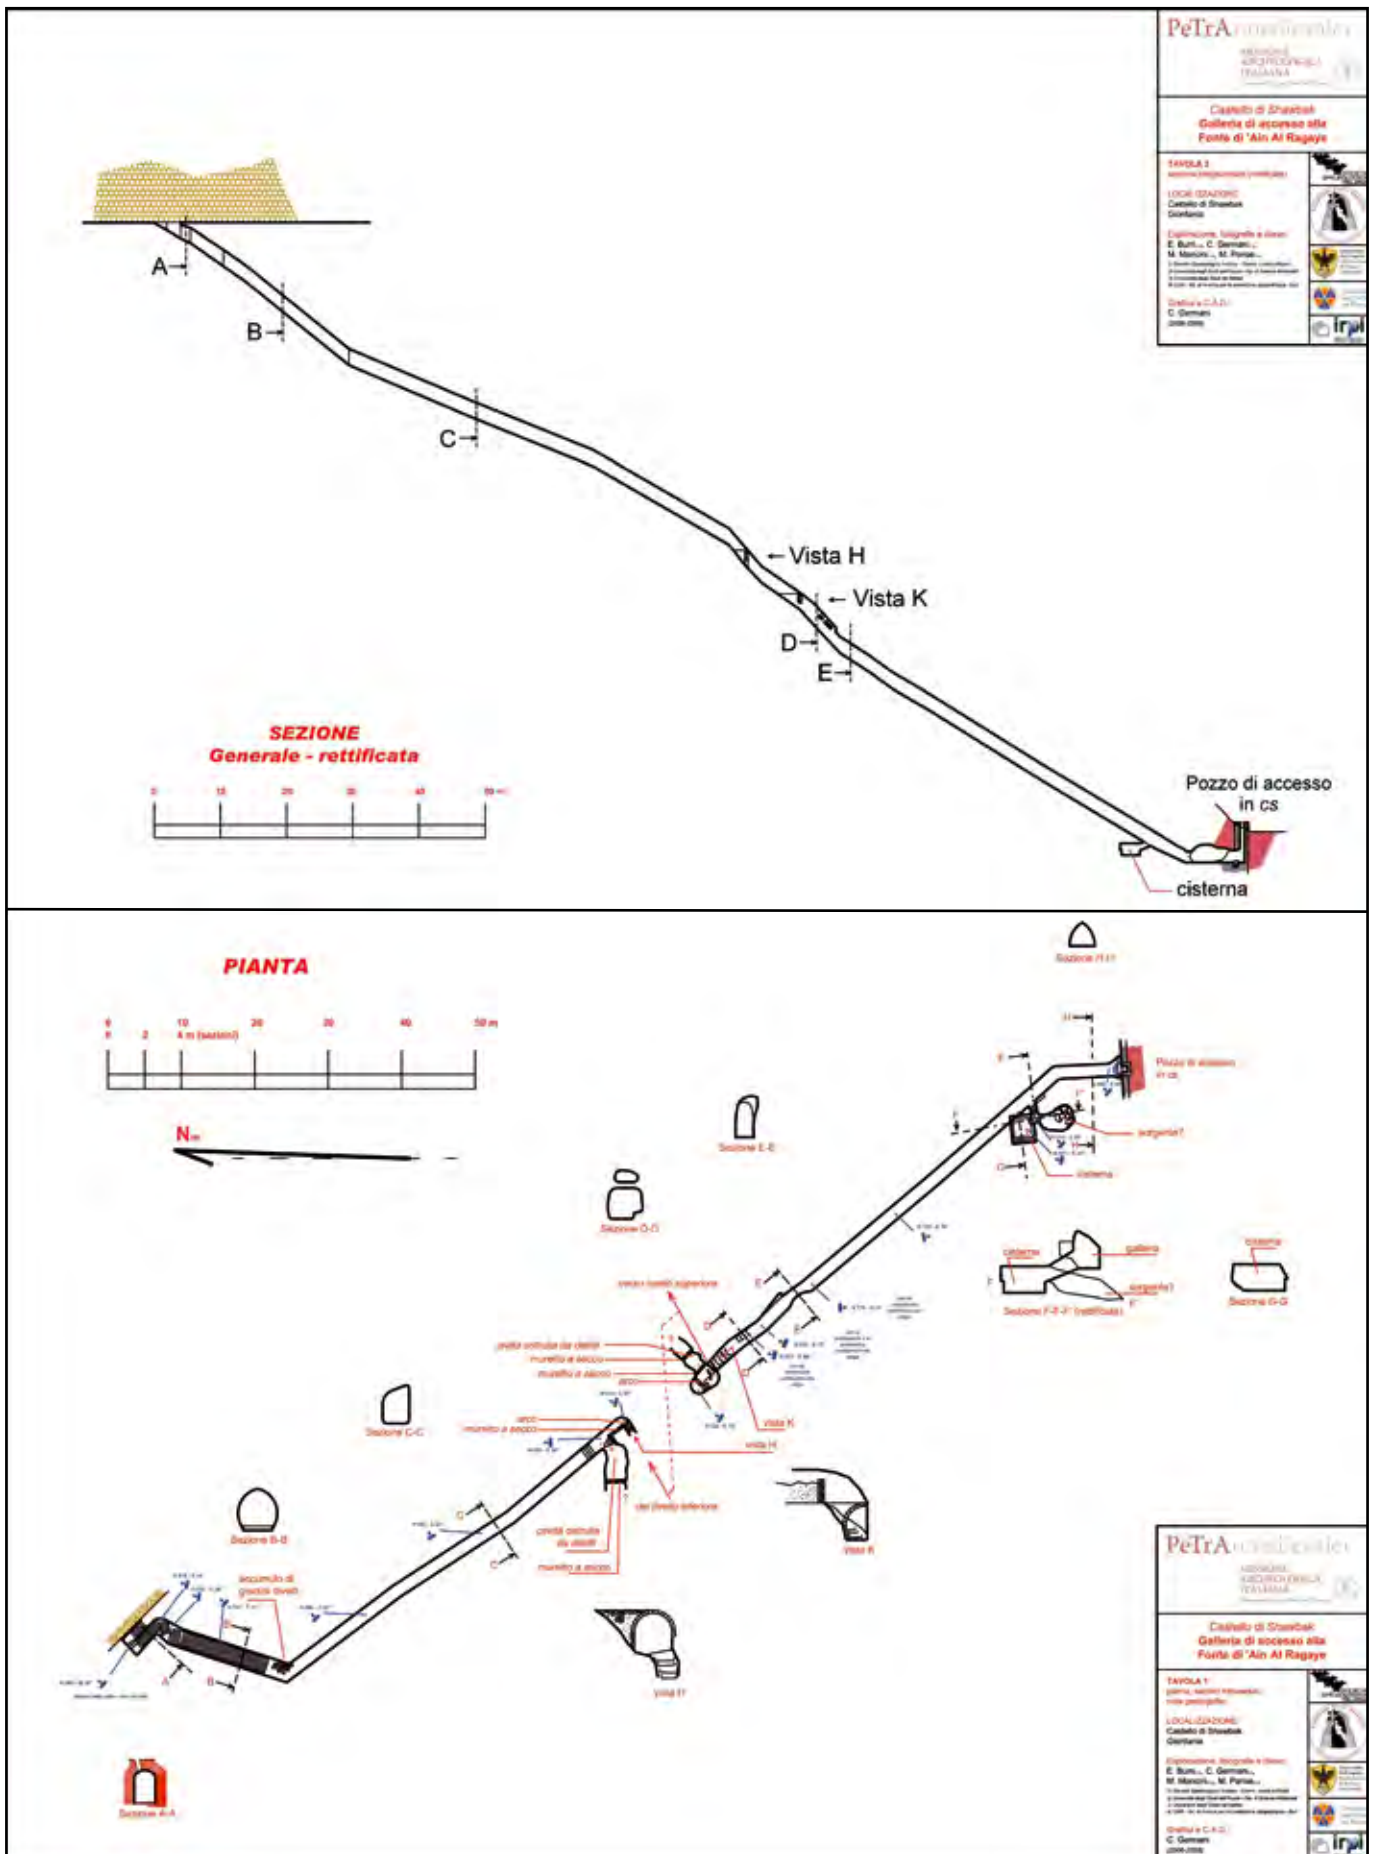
Floor plan, cutaways and rectified general section of Shawbak Castle tunnel (survey E. Burri, C. Germani, M. Parise; drawing C. Germani; SSI 2006, 2007).
